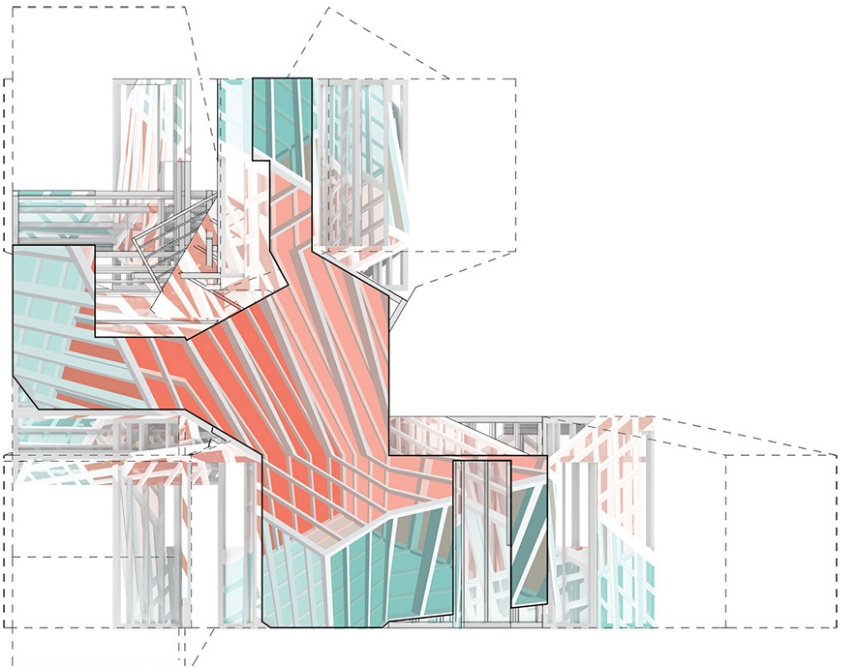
The section plan [Worldarchitecture, n.d.]
